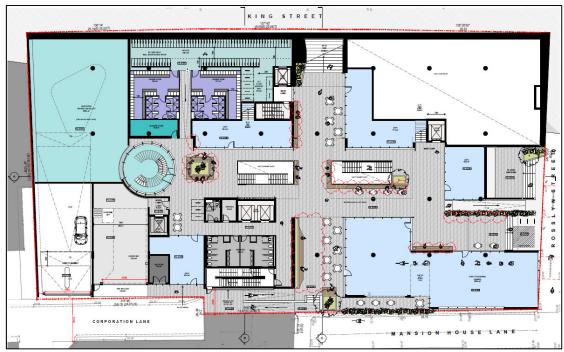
Lower Ground Floor Plan (Drawing No. TP01.04)
